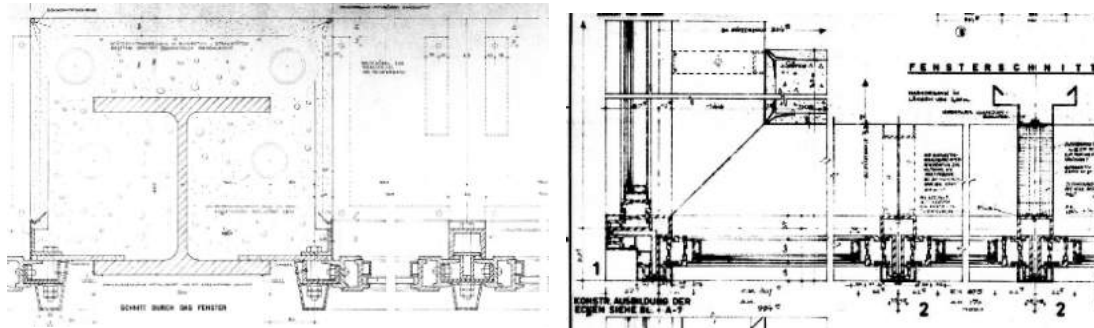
from the Frankfurt Consulate set showing a series of details for the juncture of walls and columns at perimeter and building interior. 1954. *Collection of SOM, New York
